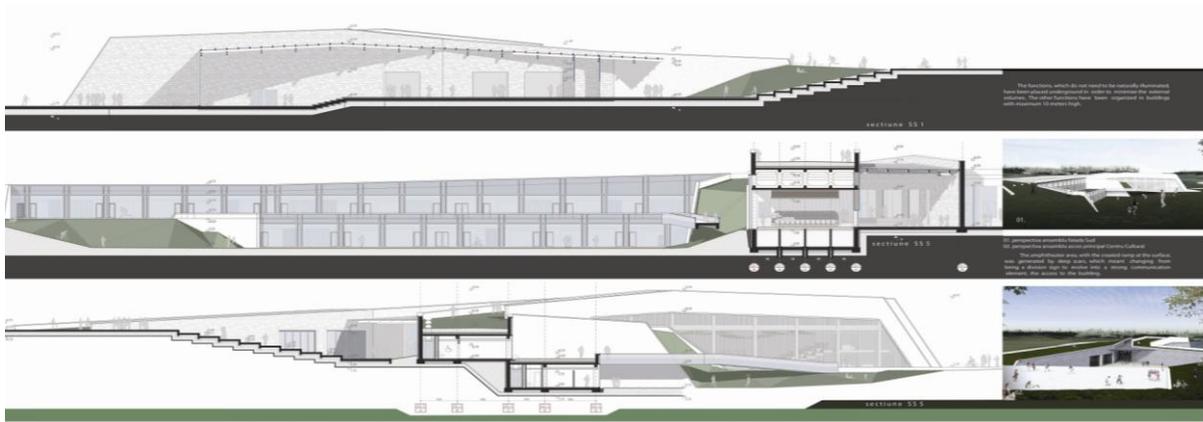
Sections plan sheet of Cultural Center “Pană Filipescu Mansion”
